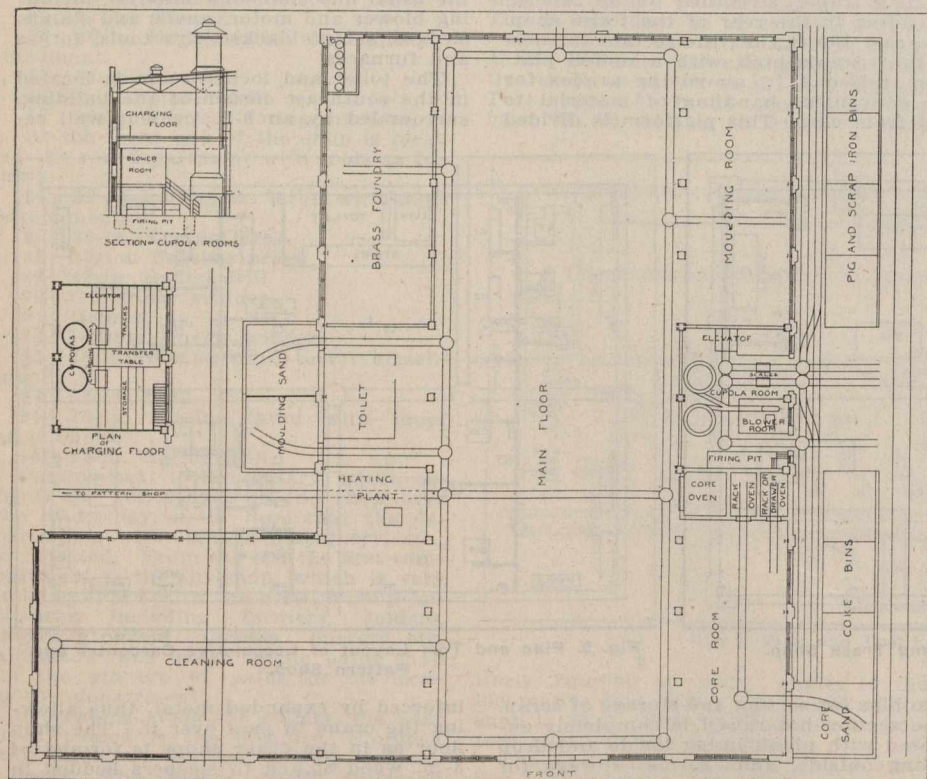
Plan and Arrangement of Grey Iron and Brass Foundries.
